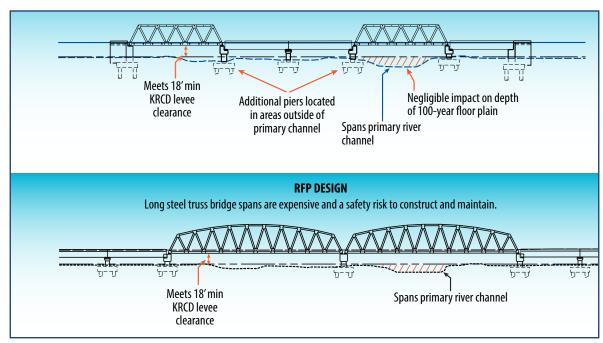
Dutch John Cut: Shorter structures are safer to construct and less costly to maintain.
